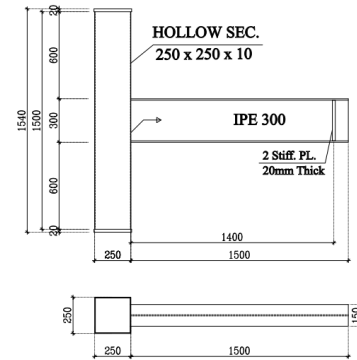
Schematic Drawing of Experimental Specimen (Unstiffened welded connections)
